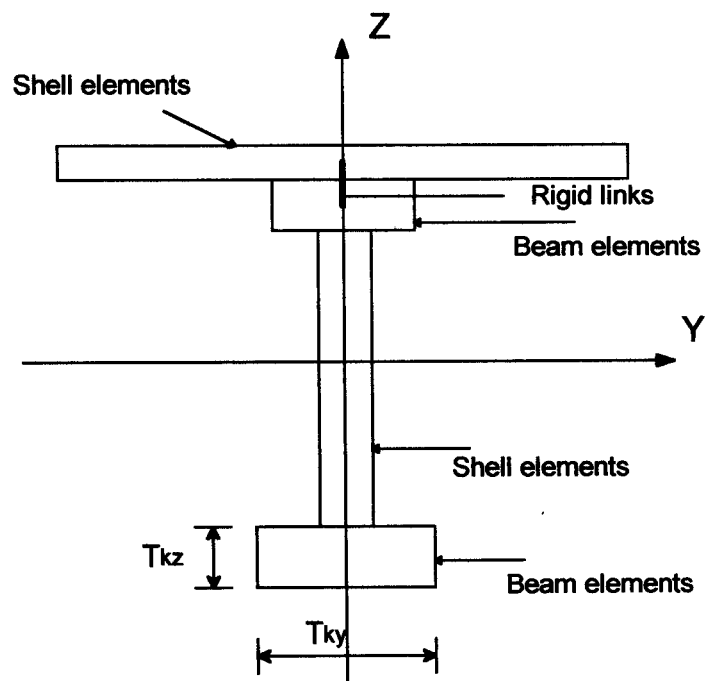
Finite element model of typical skew slab-on-girder bridge
